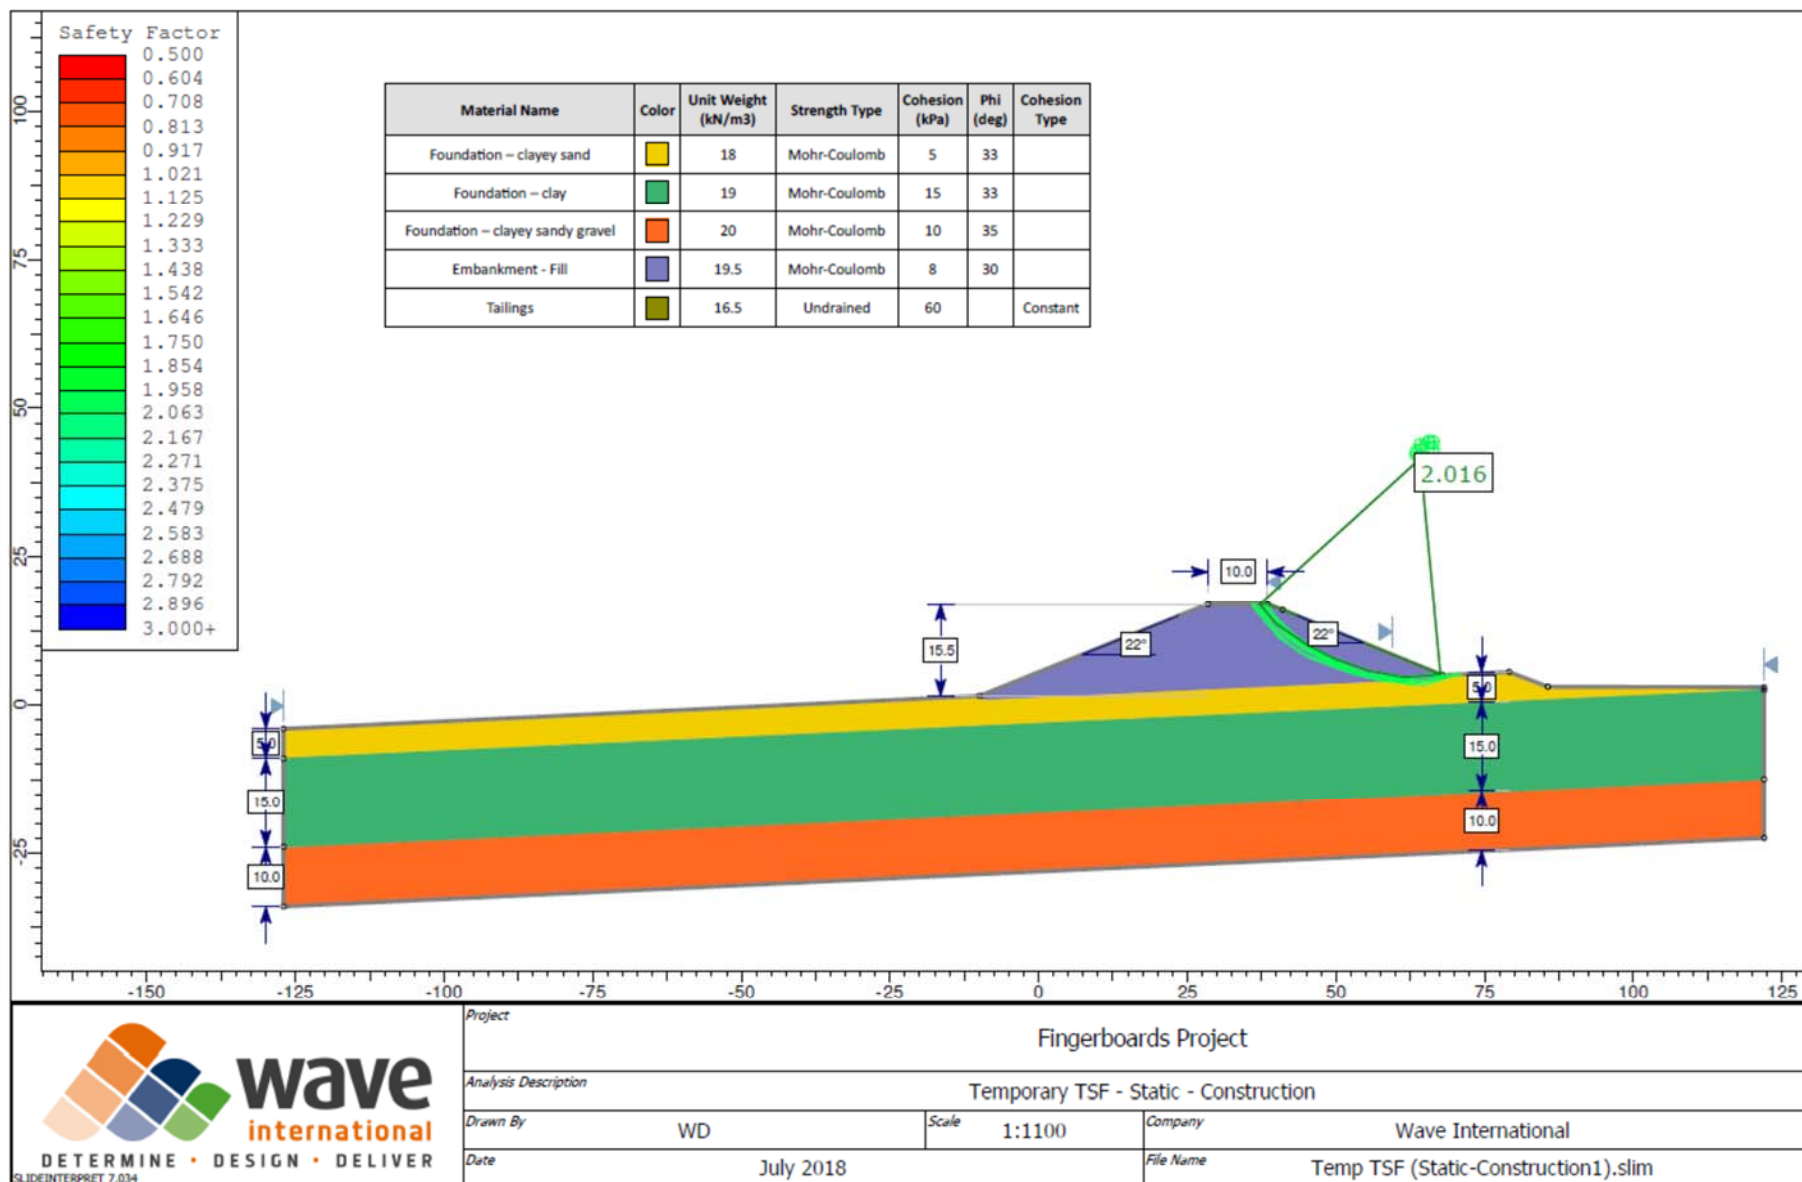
Temporary TSF – Static Construction (upstream slope)
